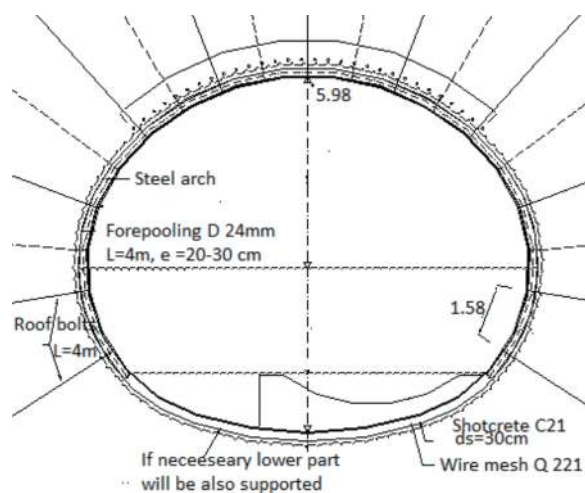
Cross section of the platform tunnel T1 excavated with roadheader, impact hammer and drill, and blast method, tunnel face has an area of 74 m².
